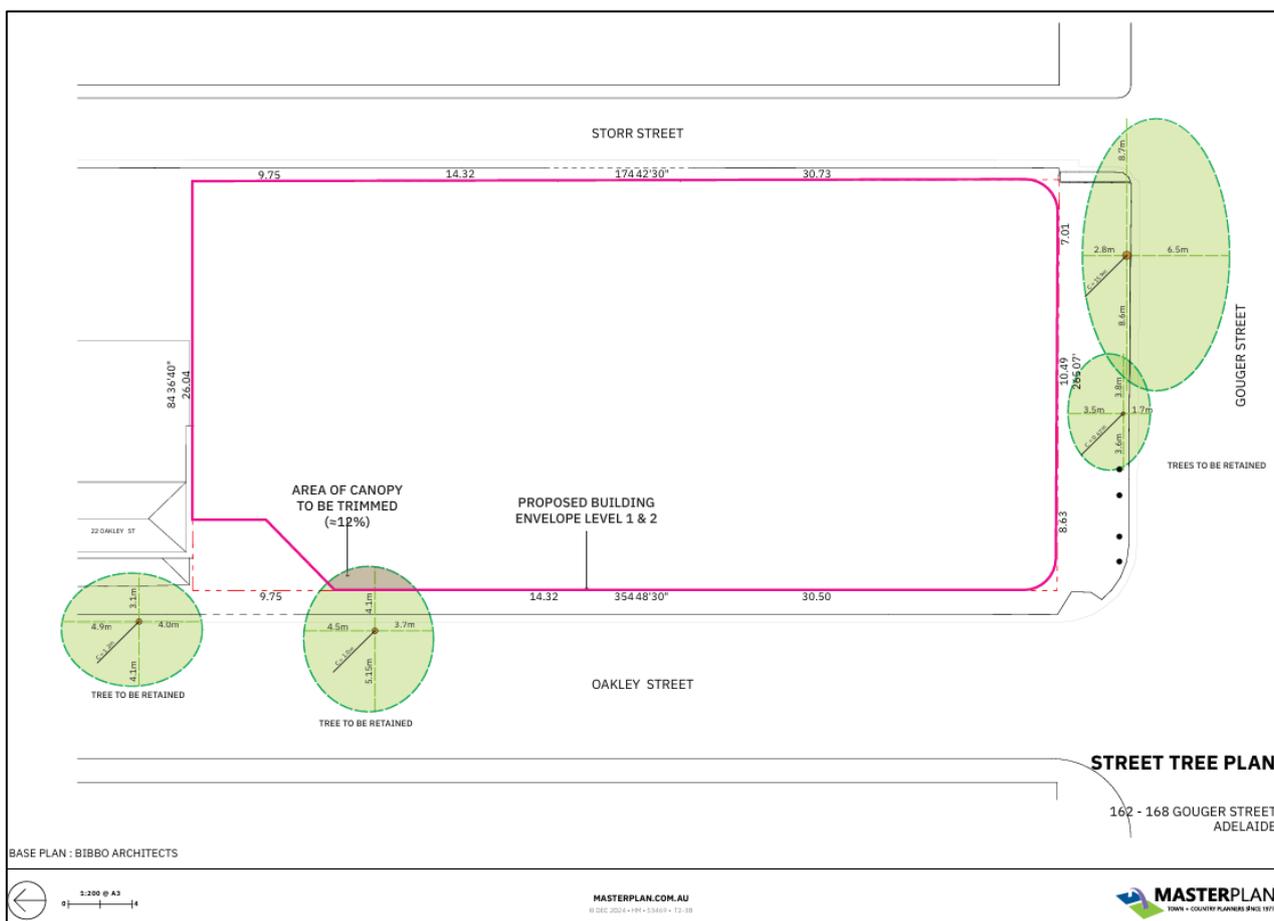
162-166 Gouger Street, Adelaide - Street Tree Plan illustrating assessed tree measurements against proposed building boundary (Masterplan; Bibbo Architects 2025)
